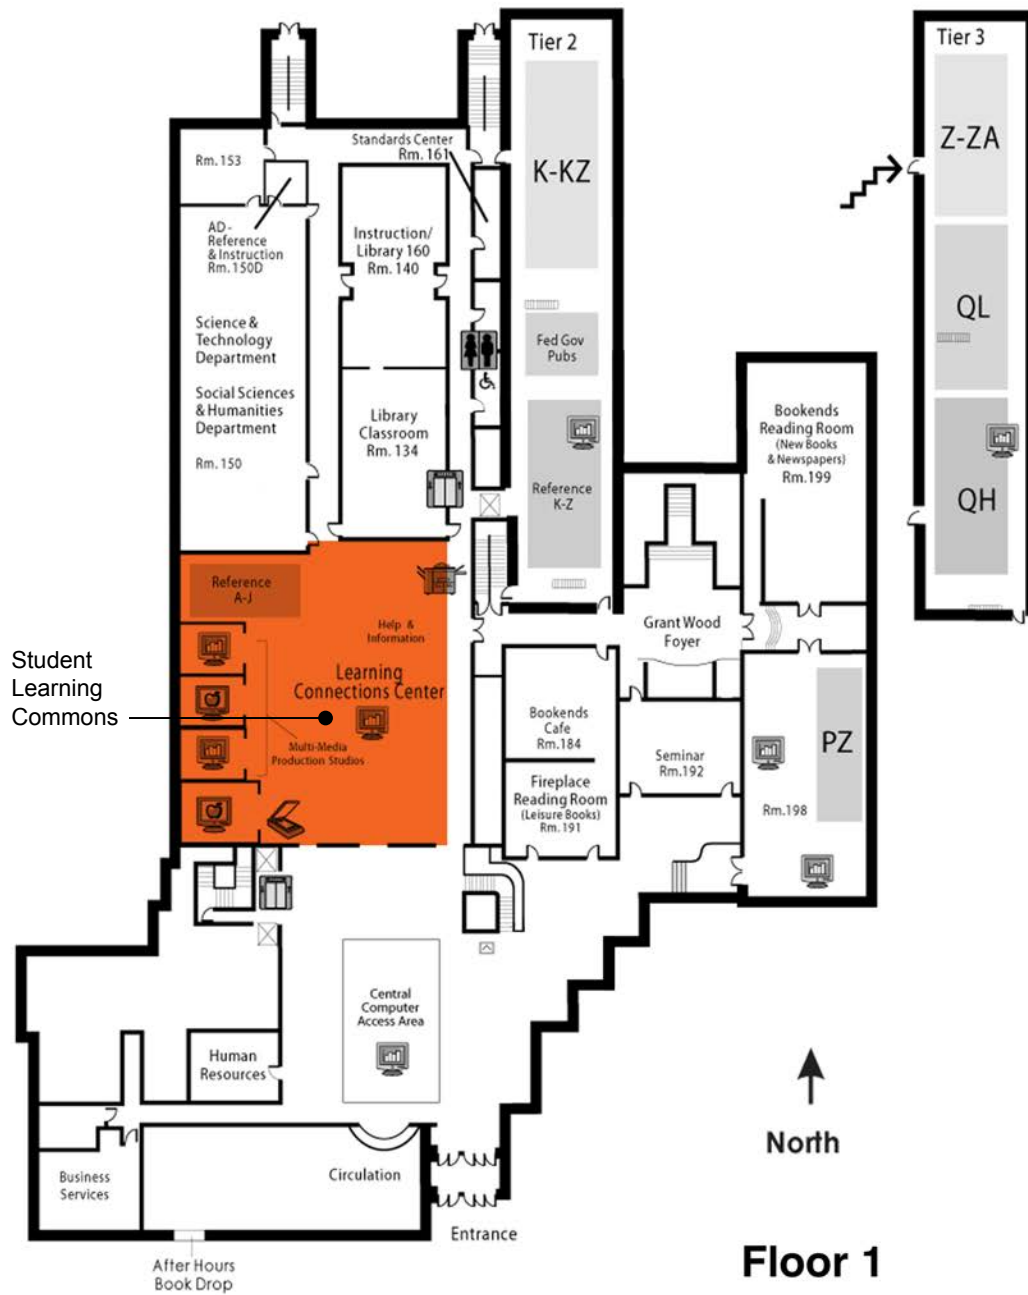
Floor plan of the student learning commons (Learning Connections Center)
